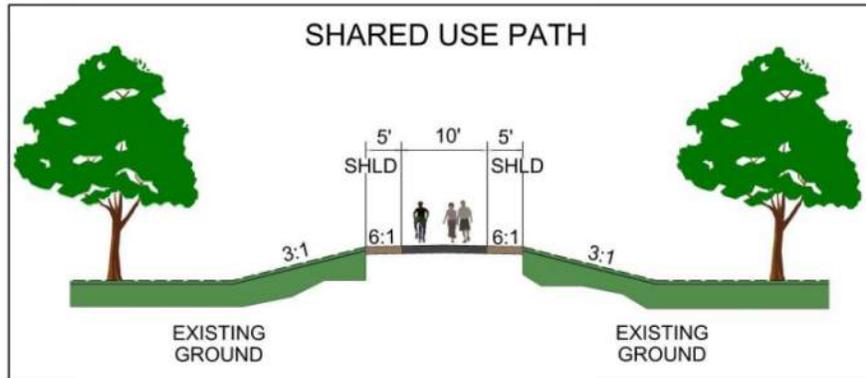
Shared Use Path Typical Section (Source: Brookings County MTP)
